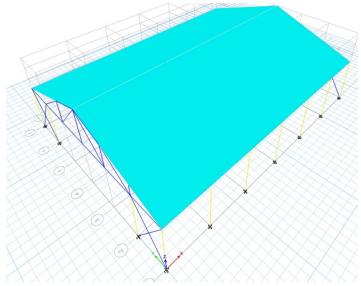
3-Dimensional model of Conventional Steel Building having 27m span Pratt truss
